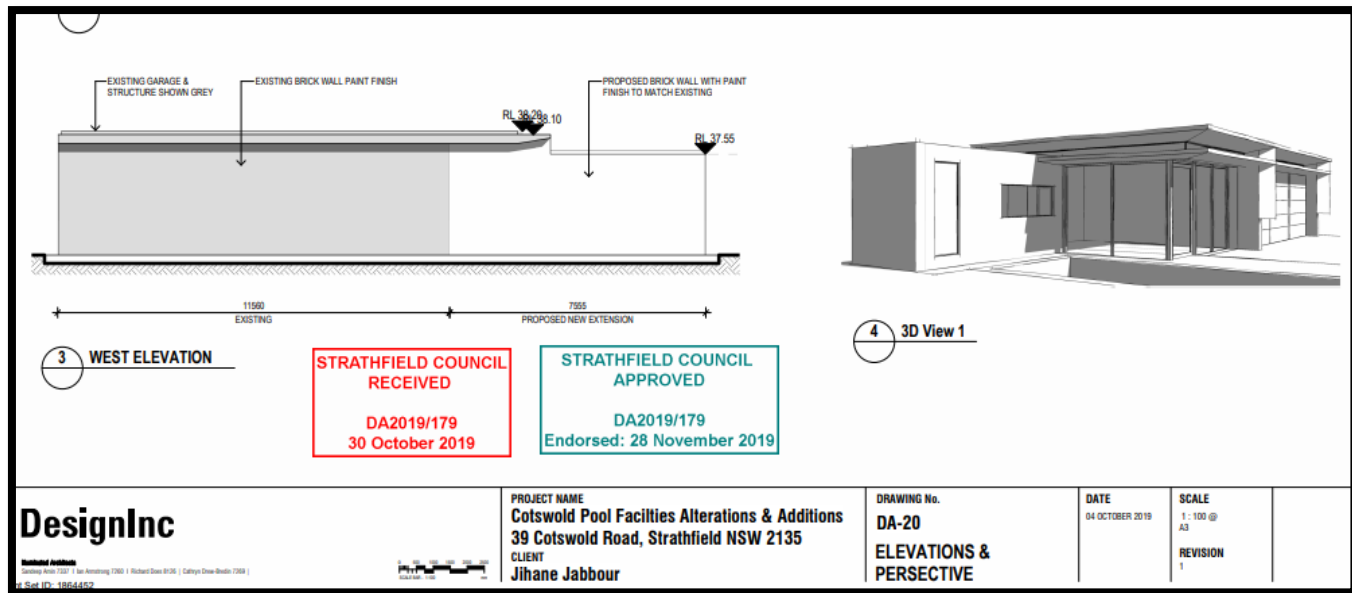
Approved elevation (DA2019/179) which shows an enclosed glass structure and bathroom facilities.
